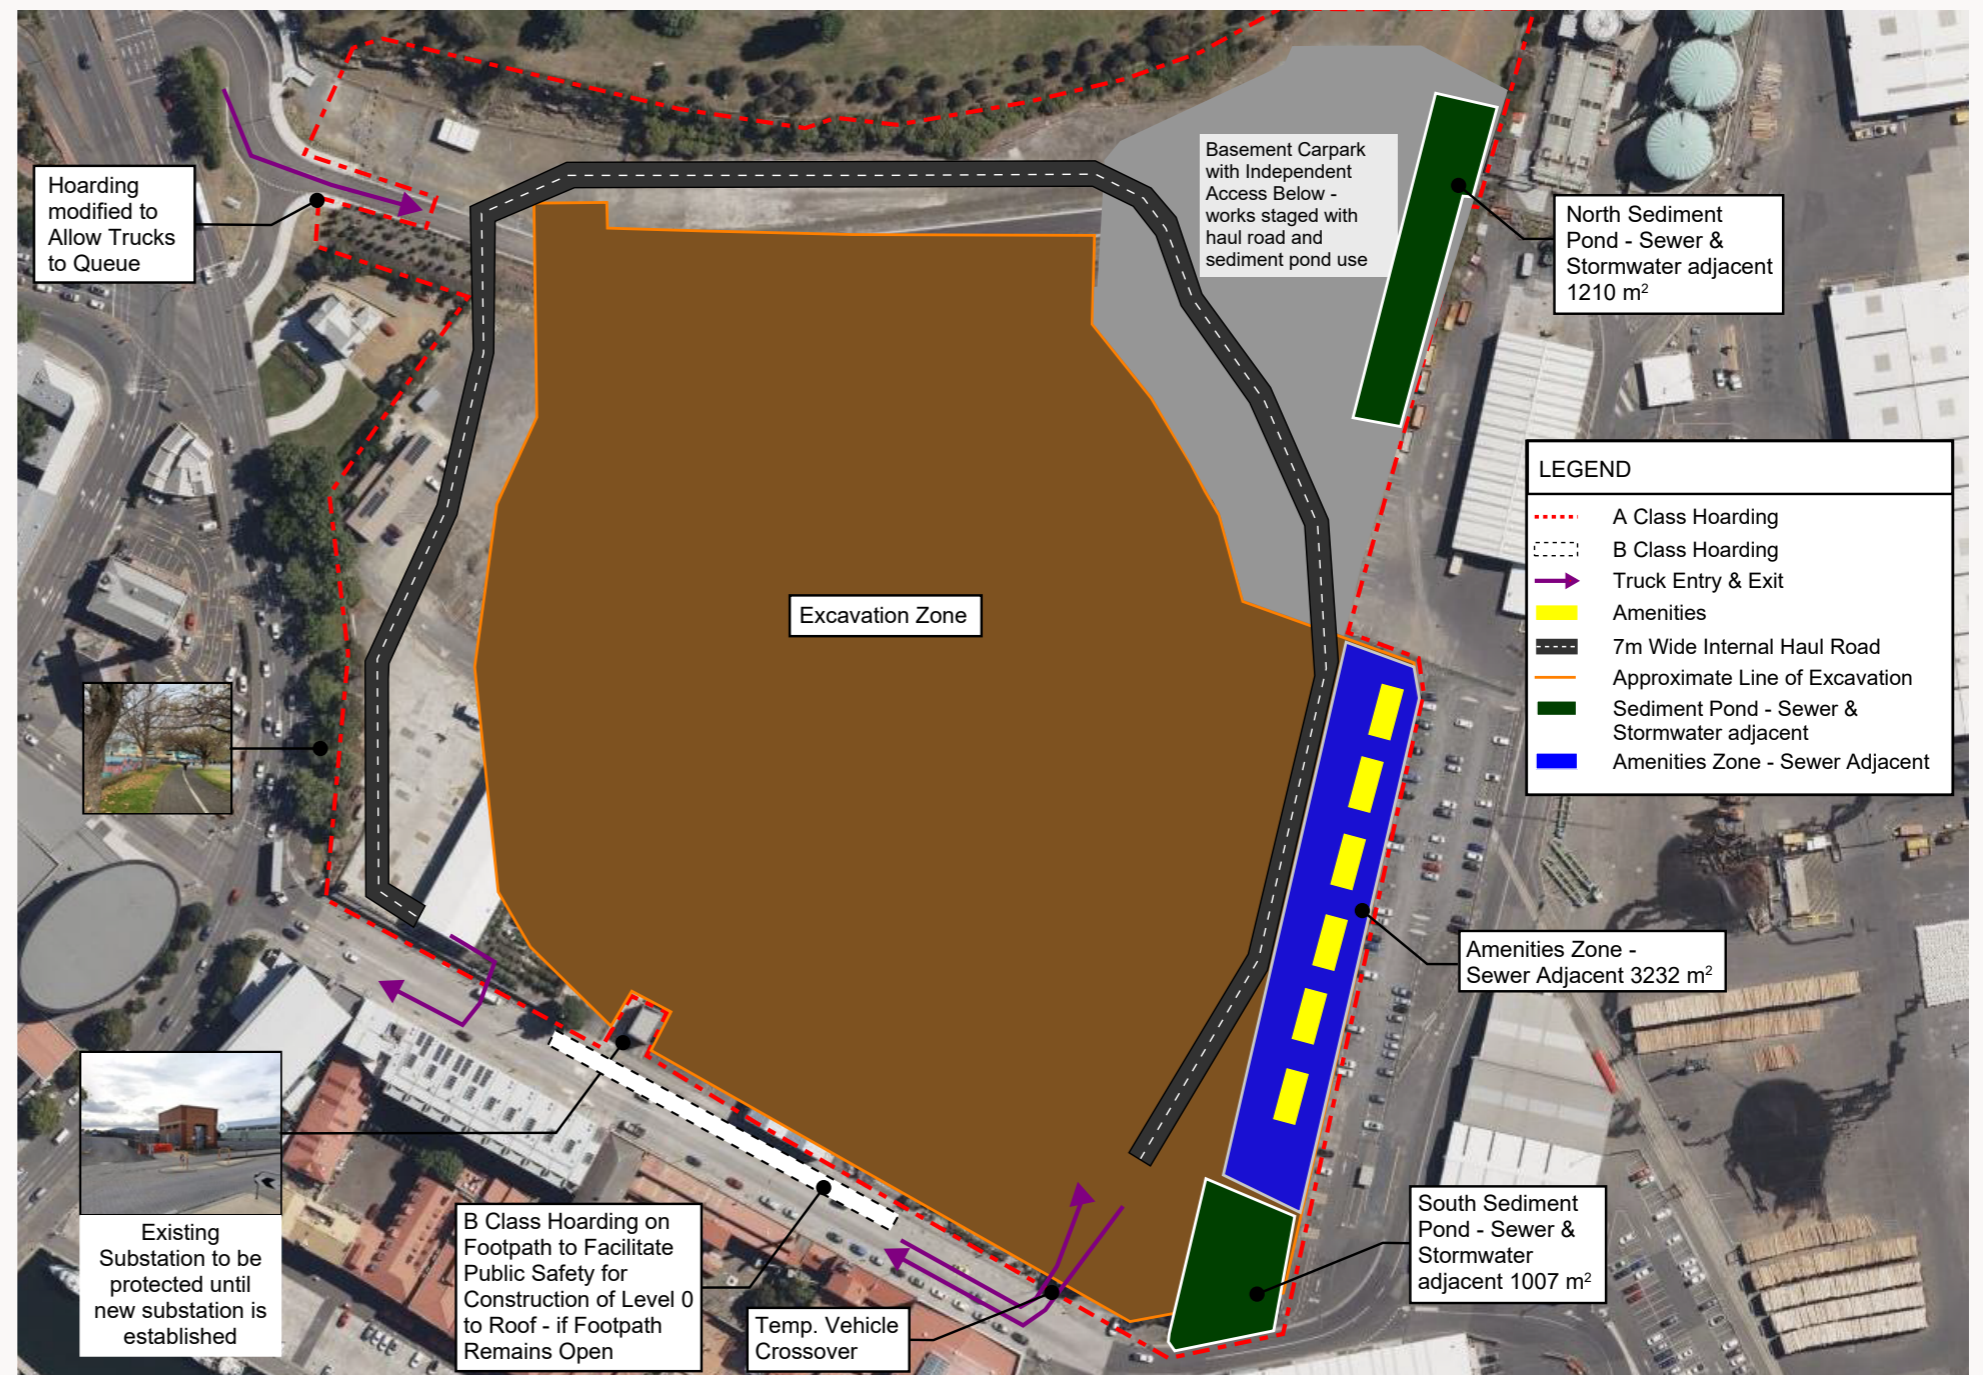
Draft Site Establishment Plan (Source: Draft Site Establishment Plan – associated with Construction Management Plan, Zancon).
